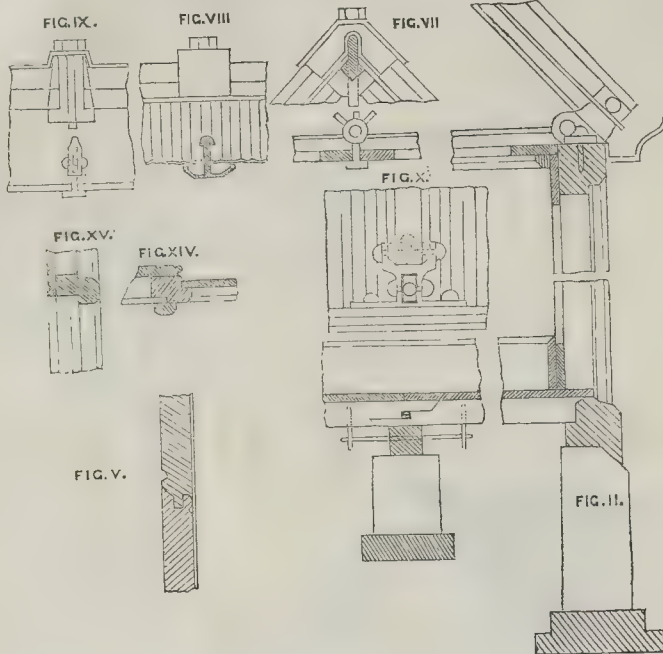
Section of sill, shewing joisted floor-boards, &c.
